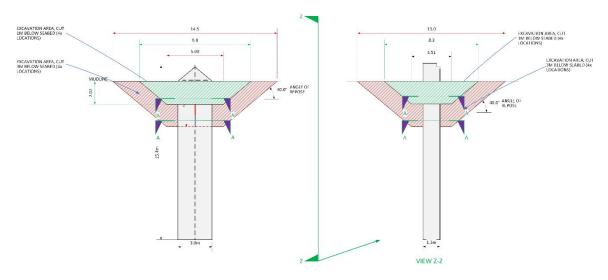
WHPS P1 indicative pile excavation requirements, sections (approx.)
